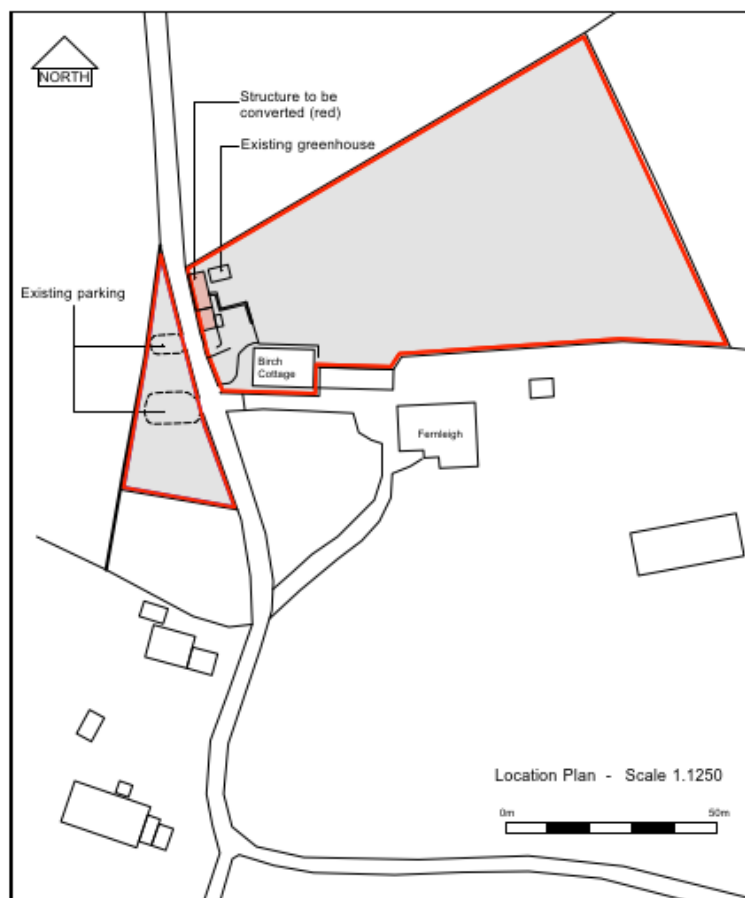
Site Location Plan (extract from 'Proposed Plans' drawing)
